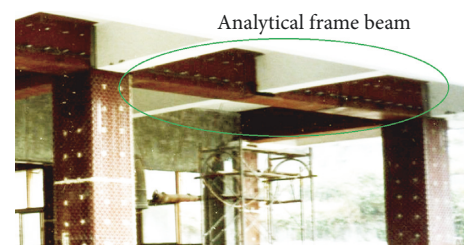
Picture of the RC frame beam strengthened by using the exterior-wrapping U-shaped steel plate.
